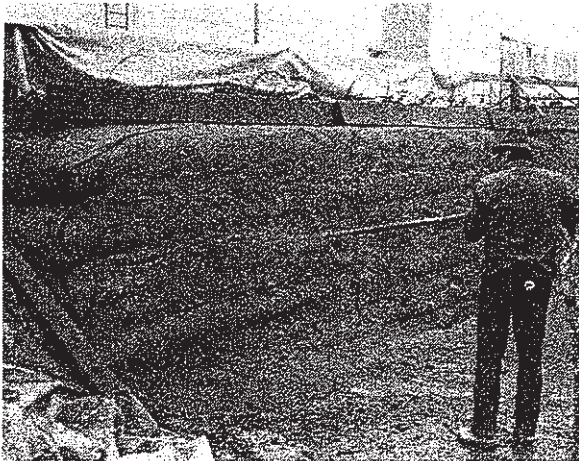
UV-protection by shotcreting; storage yard, Linz/Austria
